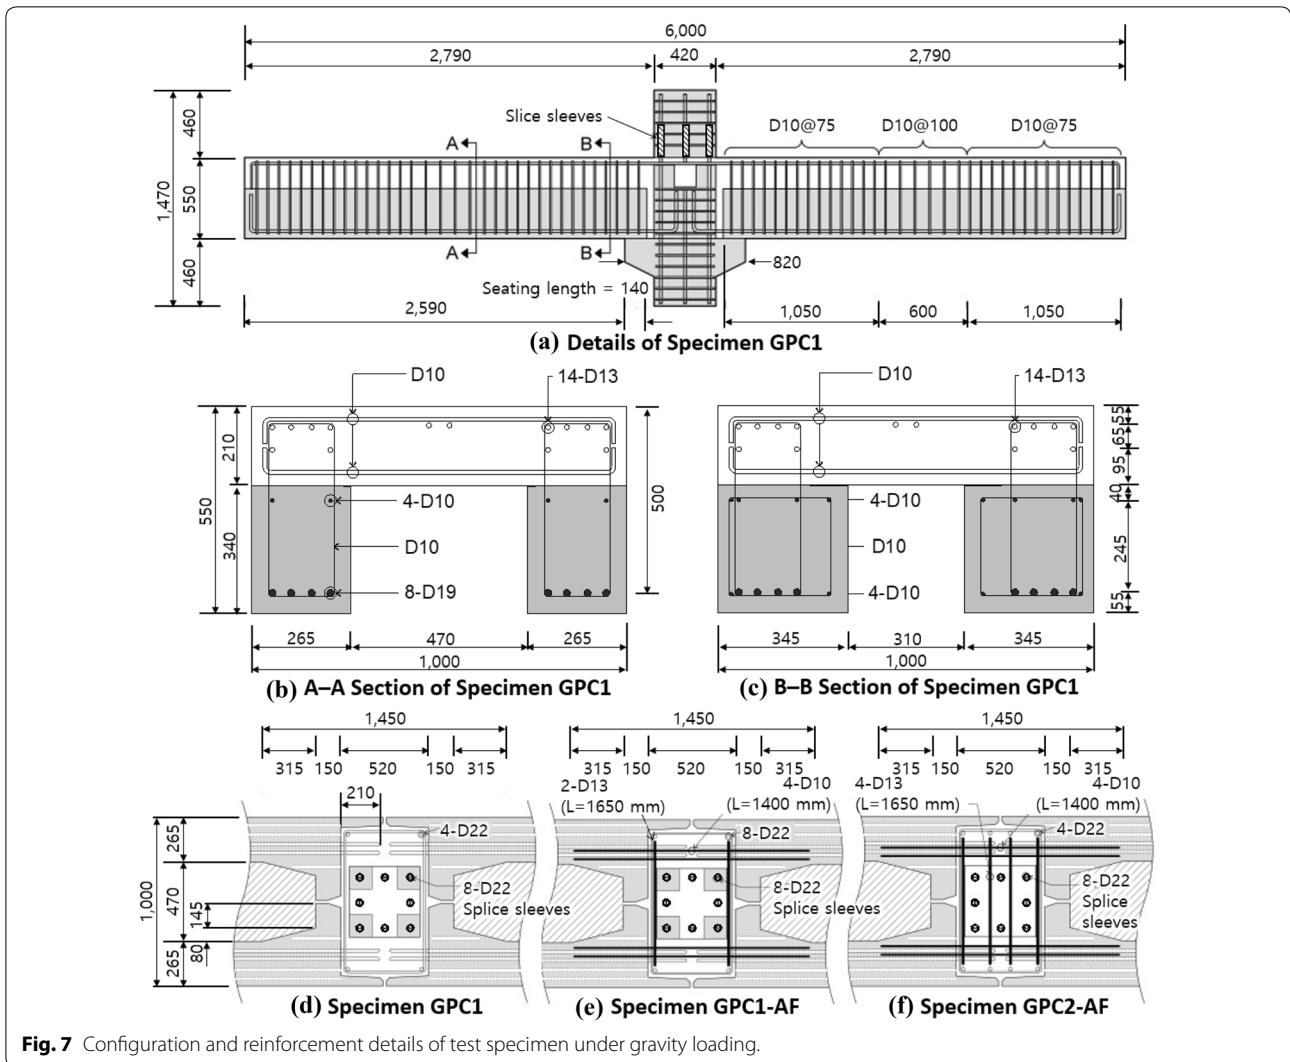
Configuration and reinforcement details of test specimen under gravity loading.
